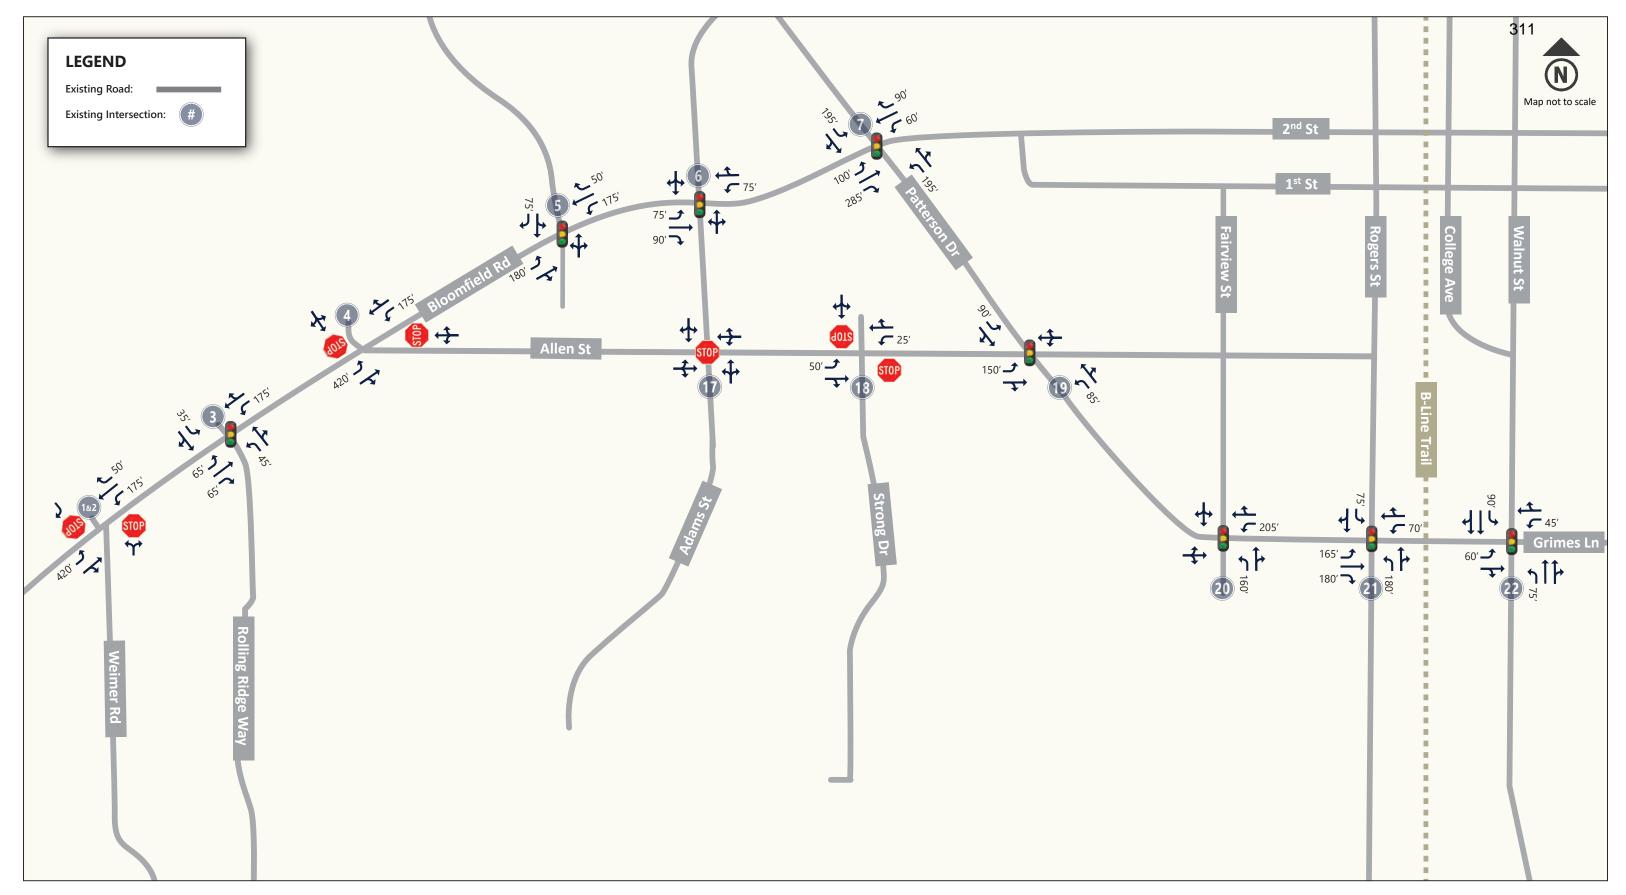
Existing Intersection Geometries: Bloomfield Road / 2nd Street, Allen Street, and Patterson Street
